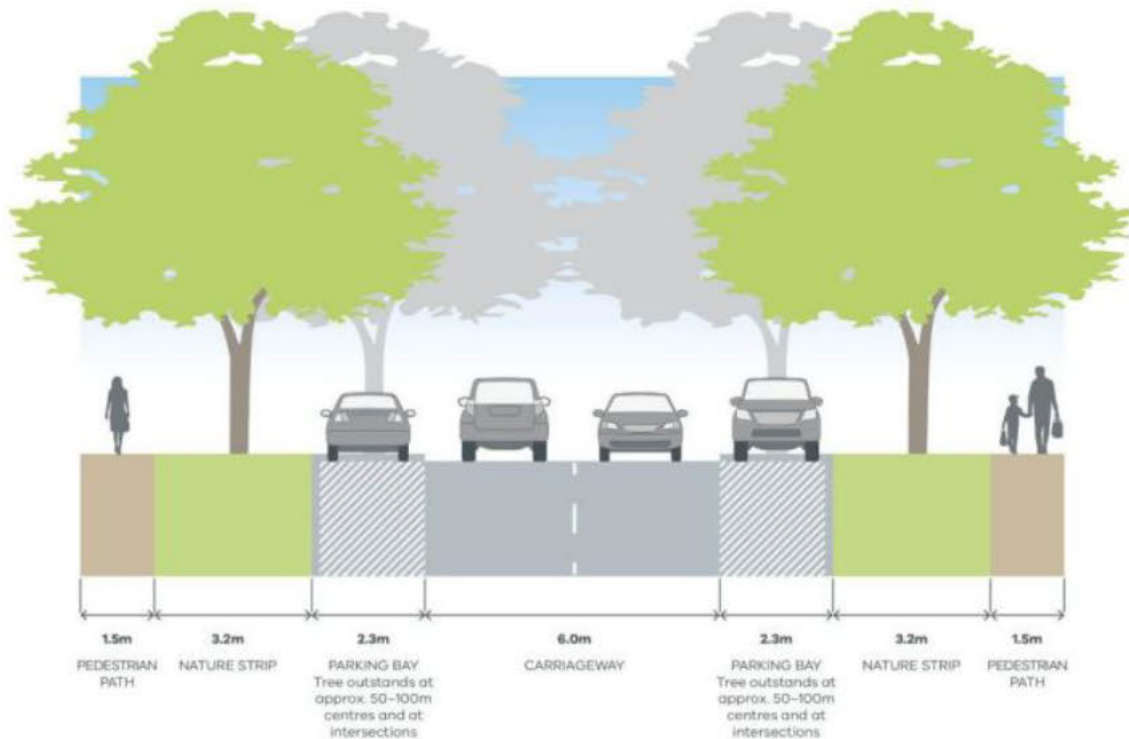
Cross Section 2 (Source: CCSPSP March 2026)
